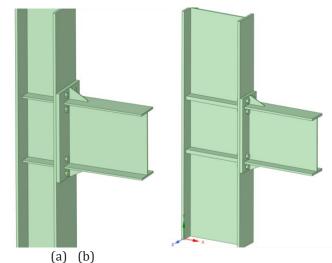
(a) American section 4-Bolt Extended Stiffened End Plate Connection (b) Indian section 4-Bolt Extended Stiffened End Plate Connection
